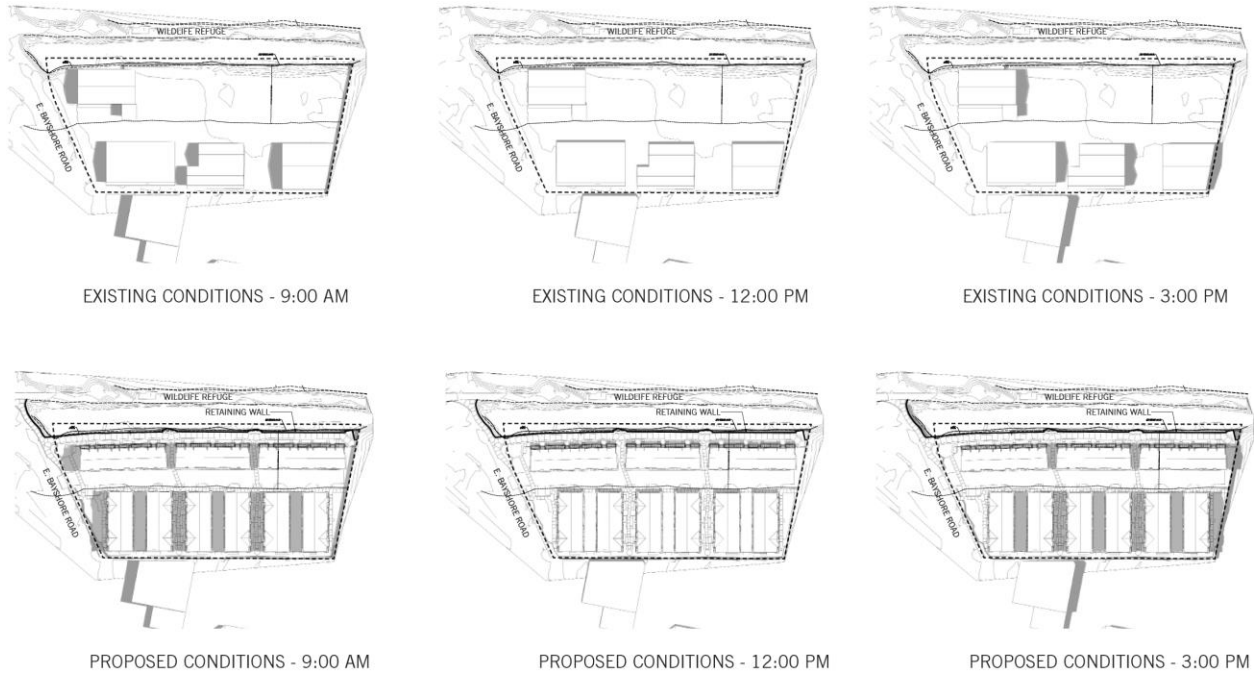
Existing and Proposed Shadow Conditions - Fall Equinox
